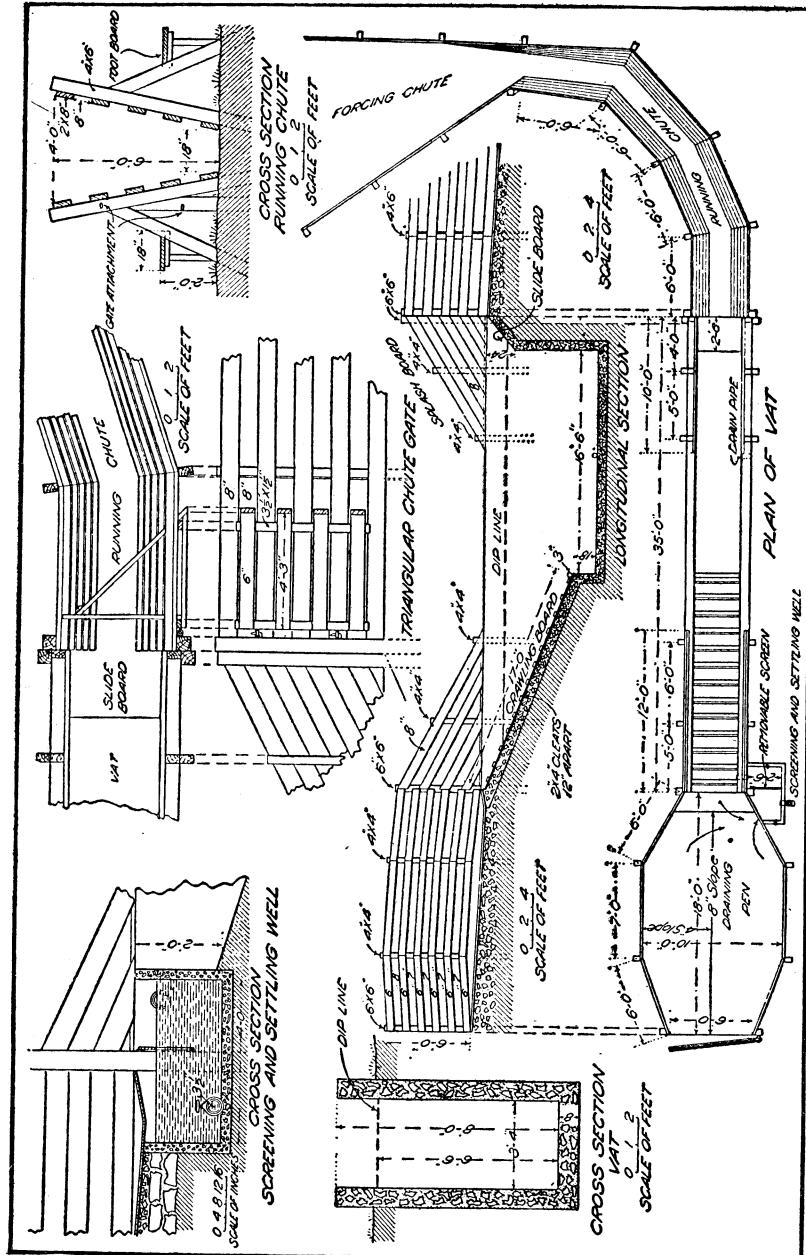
Plan of cattle-dipping plant with concrete vat.
